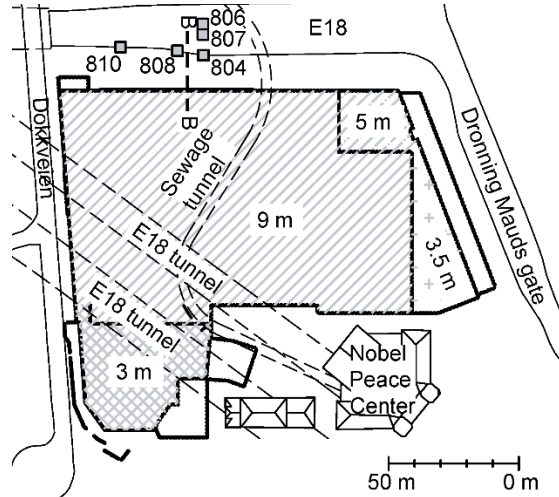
Plan view of the excavation pit from Sandene et al. (2021) including neighbouring structures, streets and the final excavation depths. Location of cross section B-B and relevant surveying points also indicated
